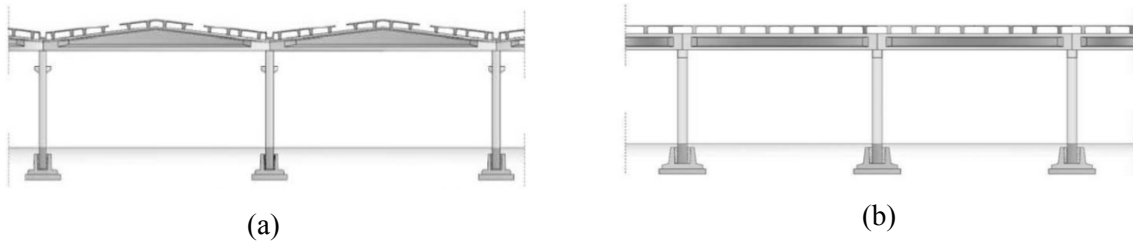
(a) Double slope roof with corrugated tiles and (b) continuous plane roof (Bonfanti et al. 2008).
